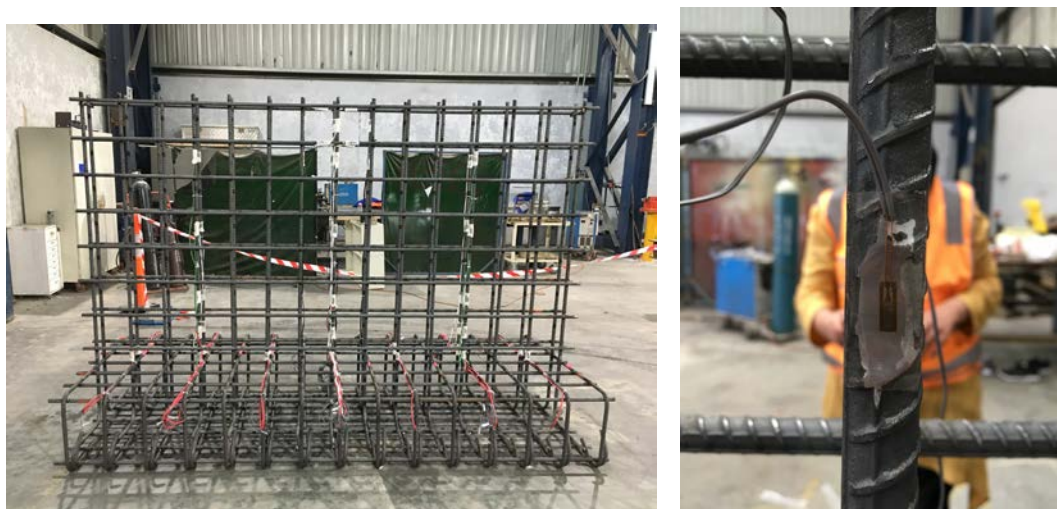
Photographs of strain gauges on reinforcement bar - specimen 2
